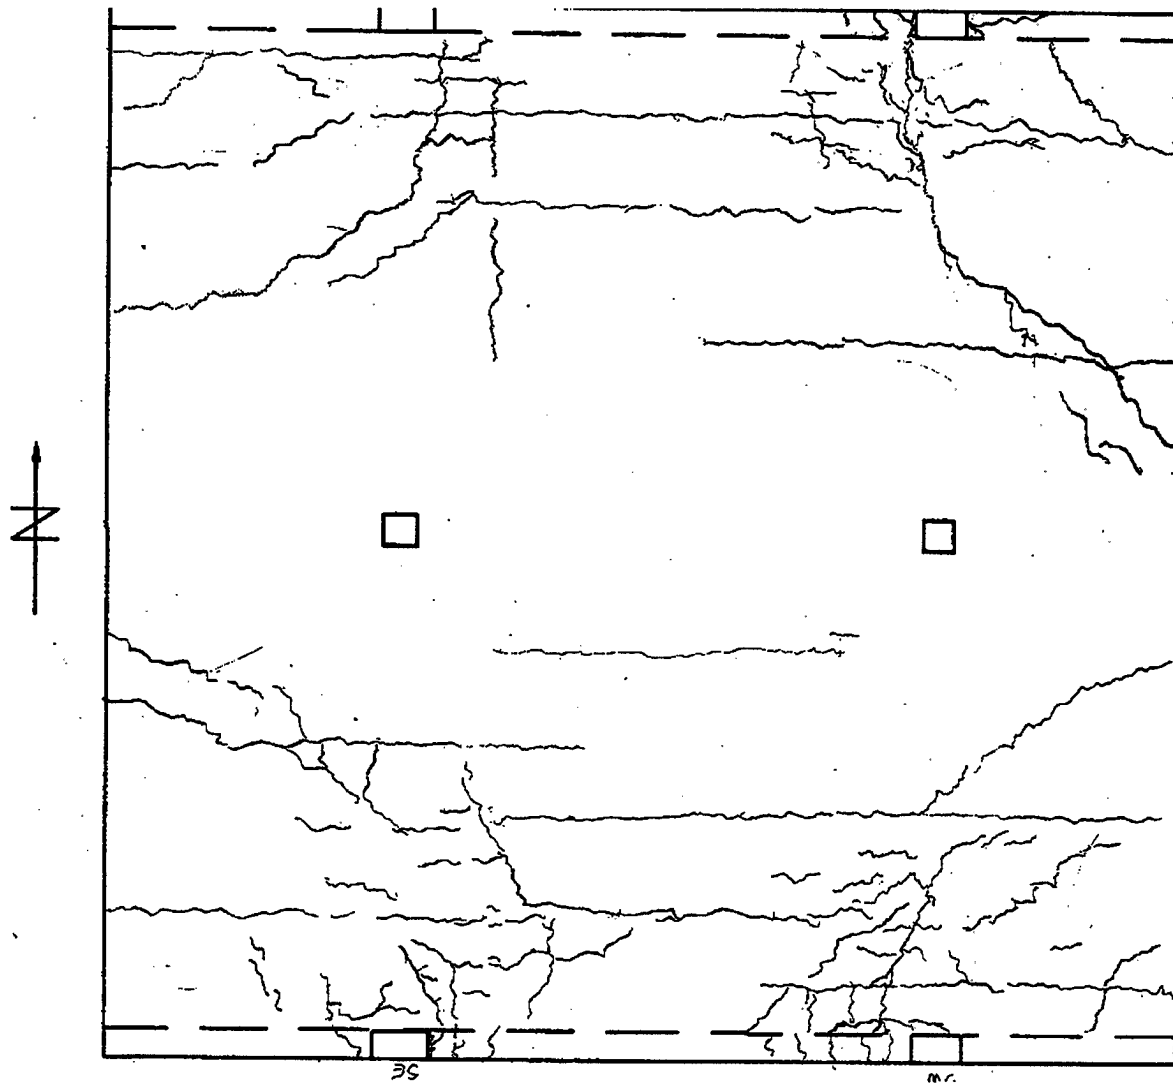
Crack Pattern, Second Floor Slab, Bottom Side, Pre-Test
